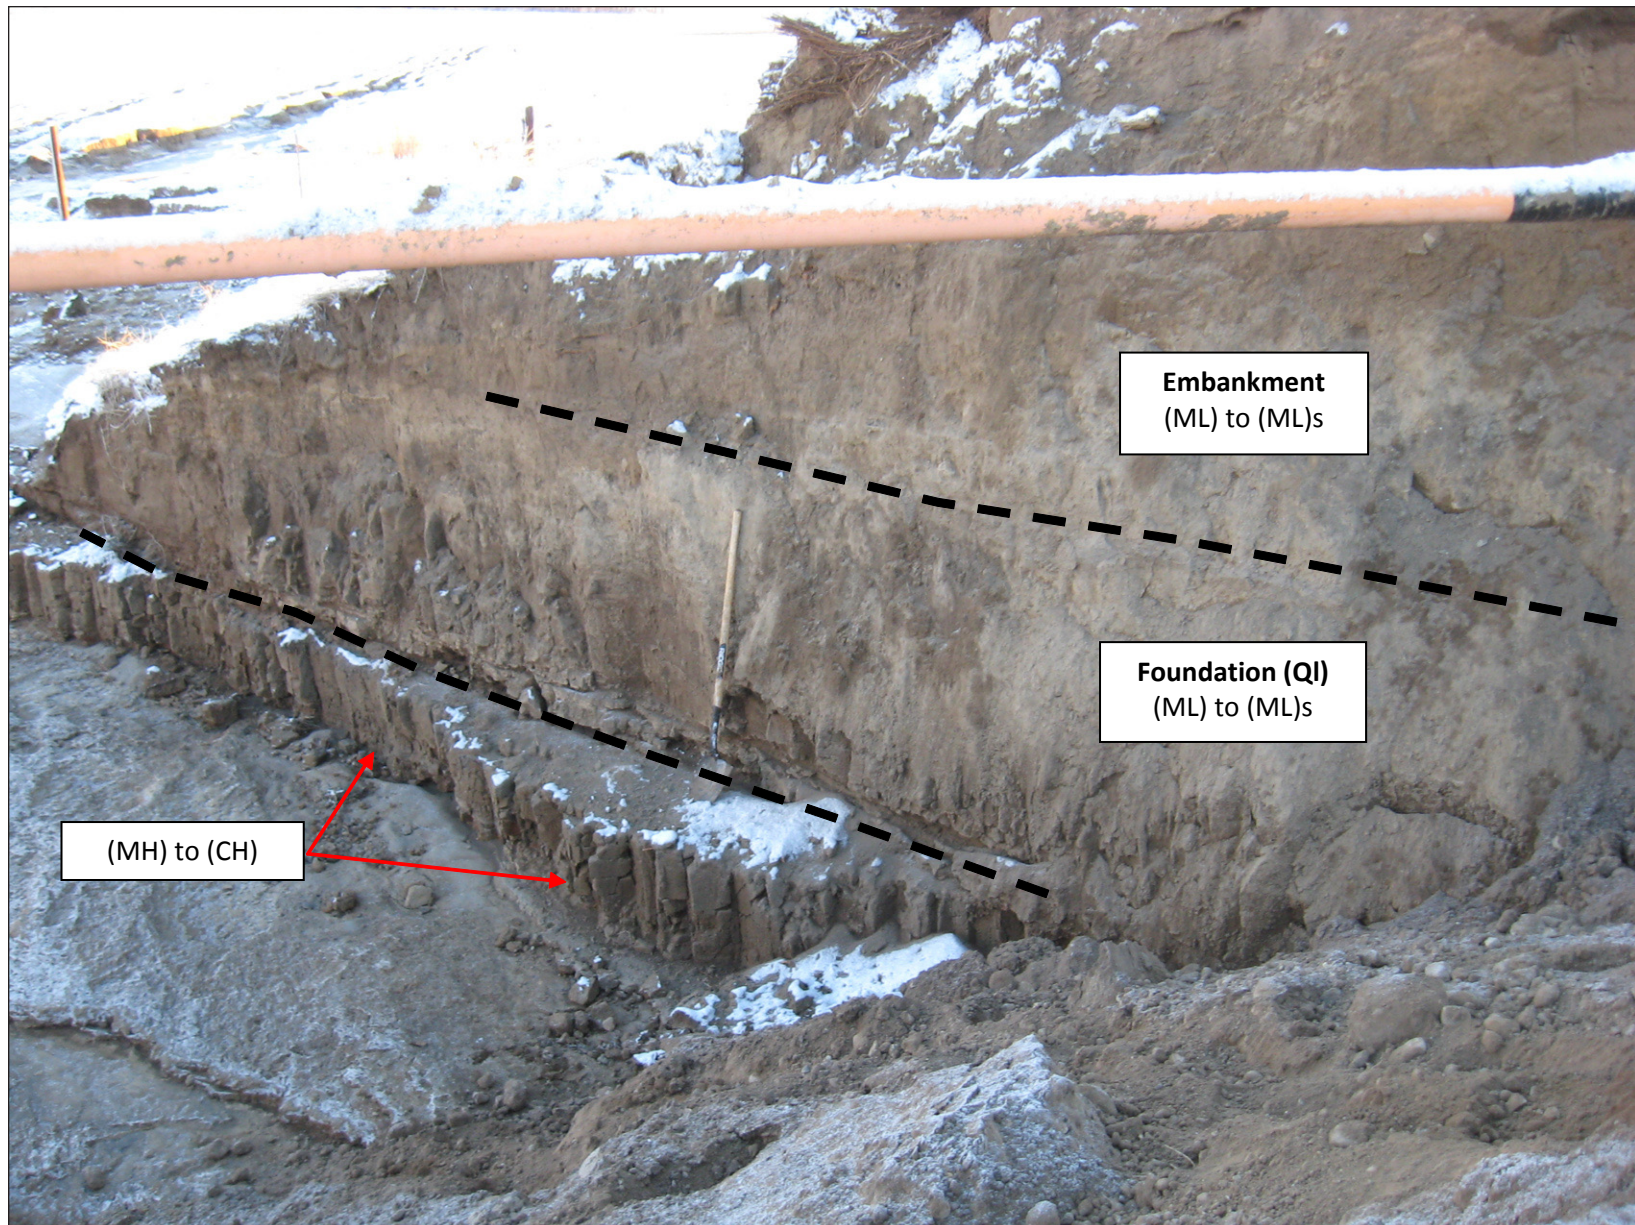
View of downstream face of breach showing approximate contact between embankment and in-place Quaternary lakebed sediment (QI). Photo by M. McCulla, 01-06-2008.
